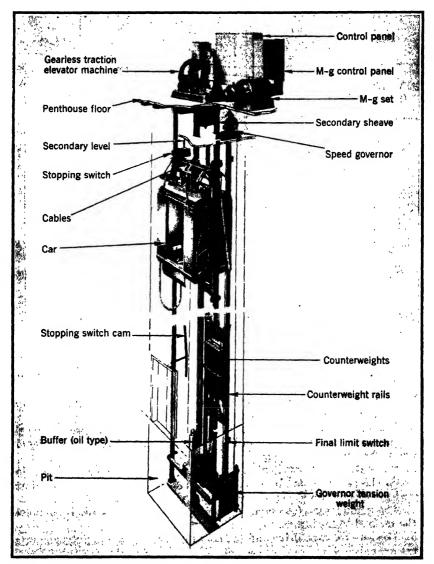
Principal equipment and parts for a gearless traction elevator installation.
